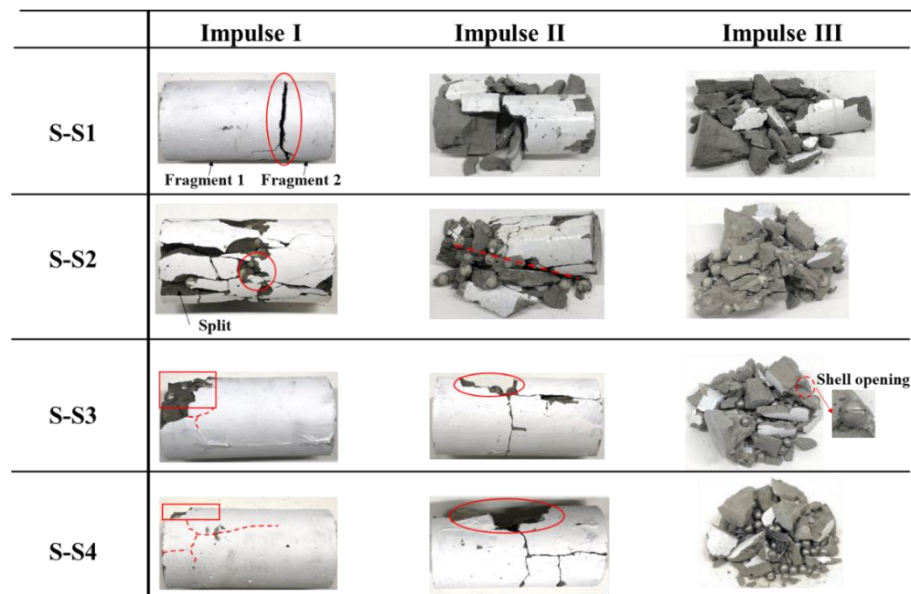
shows the final failure modes of the specimens with various configurations under different input loading (impulses I, II and III). As observed, plain mortar (S-S1) and plain concrete (S-S5) are experienced significant dynamic fracture (i.e., spalling) and they are disintegrated into two parts under impulse I owing to insufficient tensile strength. These failure modes of plain mortar and concrete are consistent with the experimental results reported in the previous studies [115, 166, 167], and the fracture profile agreed with the results reported by Klepaczko and Brara [168]. Metaconcrete specimen with RCSBs (S-S2) experienced columnar cracking through both ends, and severe localized damage is found in the middle region due to stress concentration at the interfacial area around RCSBs. This damage mode is also consistent with the results reported in the previous studies [31, 88, 89]. Besides, metaconcrete specimens with both types of ERCSBs (i.e., S-S3, S-S4, S-S6 and S-S7) are experienced localized damage and only several cracks appeared near the loading end under impulse I, as illustrated in Figure 7-11(a) and (b). Based on the above results, metaconcrete specimen with ERCSBs demonstrates better impulsive loading resistance as compared to metaconcrete specimen with RCSBs (S-S2) as well as plain specimens (S1-S1 and S-S5) under impulse I.
